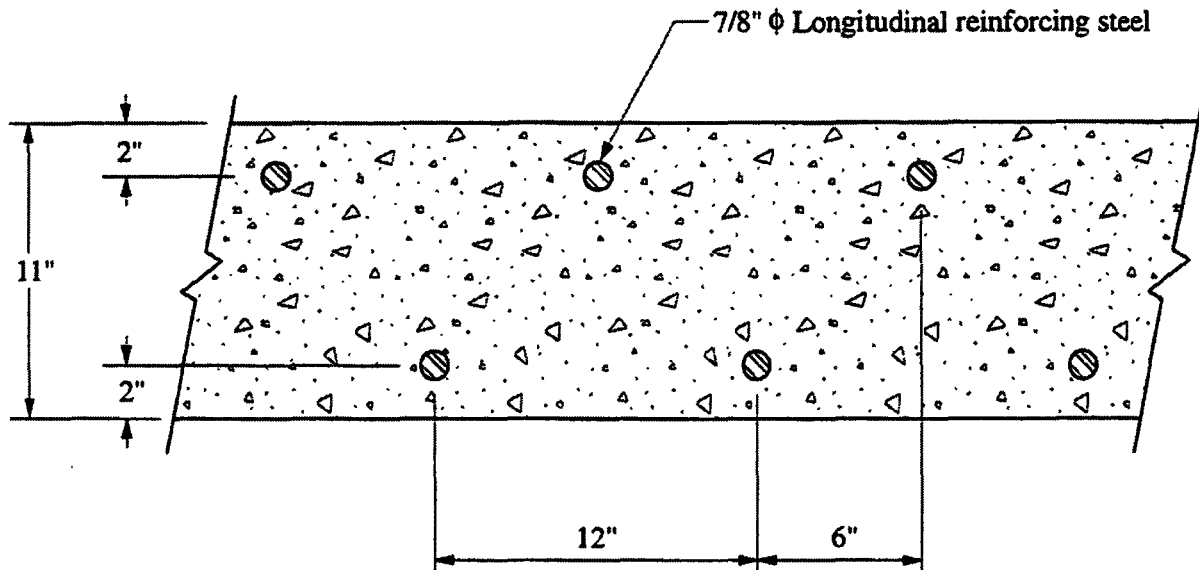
Bridge VI: Configuration and reinforcing details at crown of arch.
